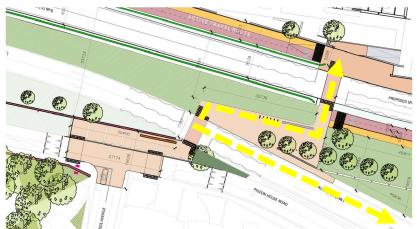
Excerpt from 'Active Travel Route: Proposed Site Plan - Partial Site Plan D Maritime Village & Pigeon House Rd' (Source: Dwg. No. CP1901_011-DA-00-XX-DR-A-PA-004)
